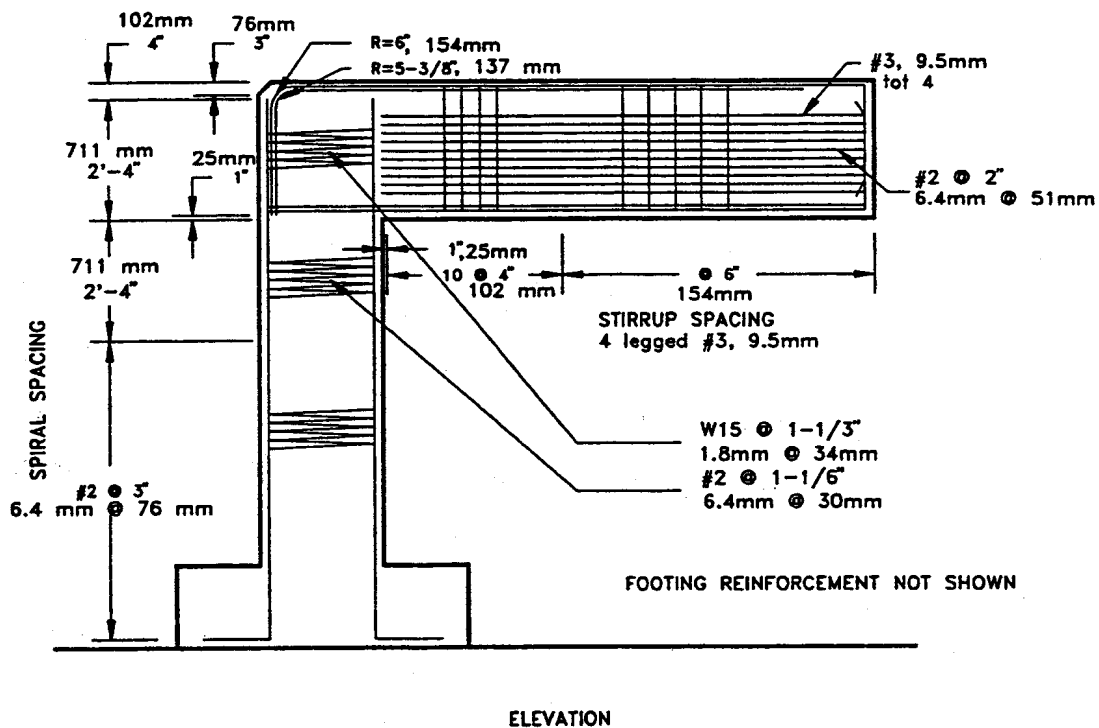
Reinforcement Details of as-Built Specimen with a Rectangular Column Configuration (Adapted from Ingham et al., 1994a)
